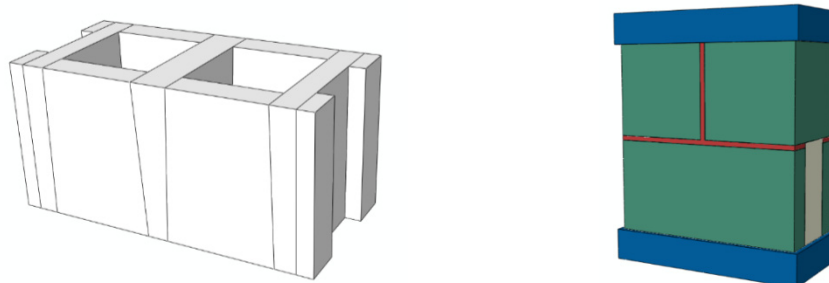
Concrete Unit Geometry and 2 Course (390 mm) Prism Test Assembly
